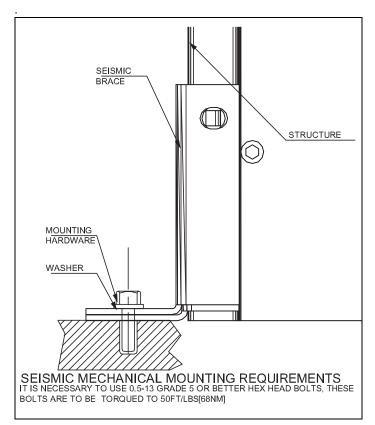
Seismic Tested and Approved Product Mounting Instructions.
